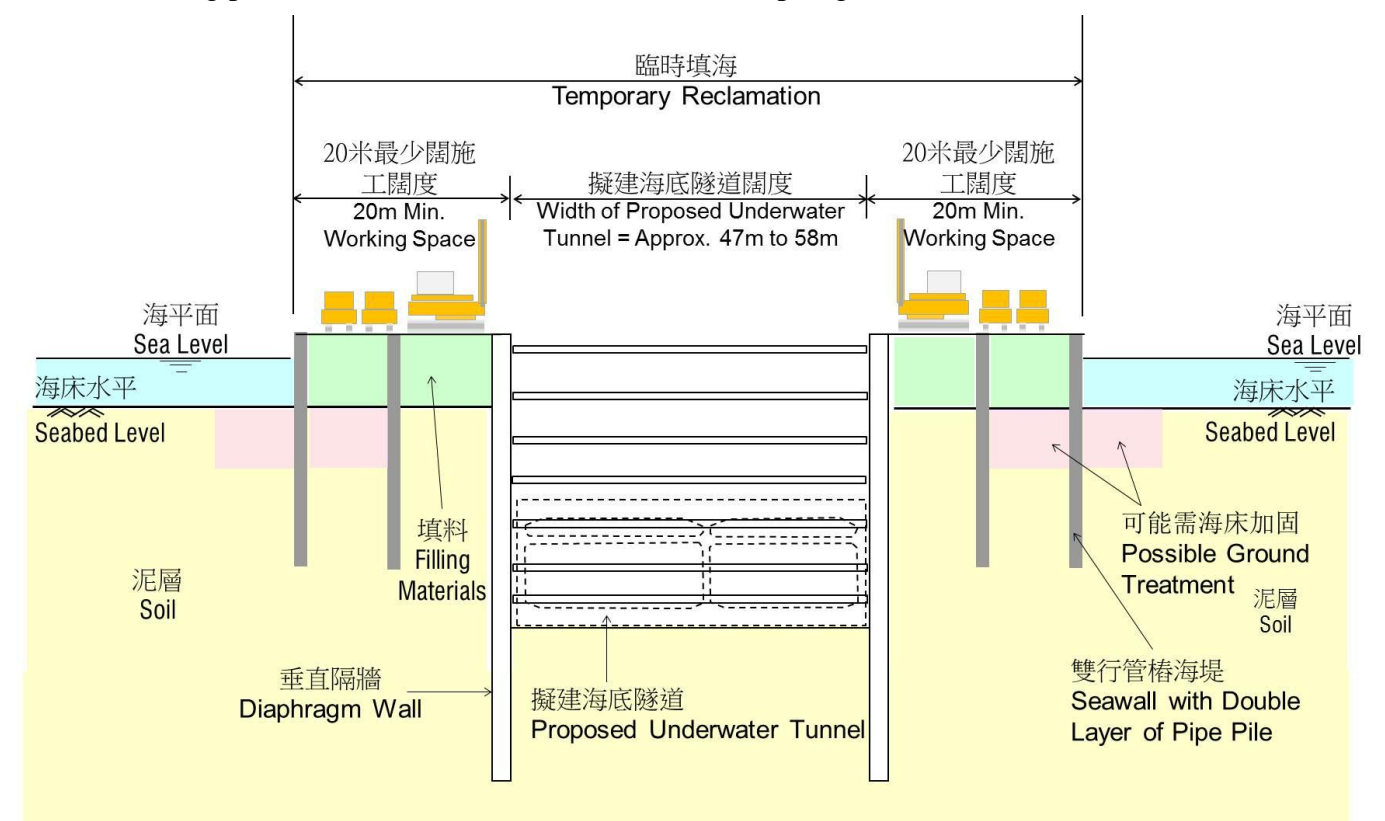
Typical Cross Section of Temporary Reclamation
